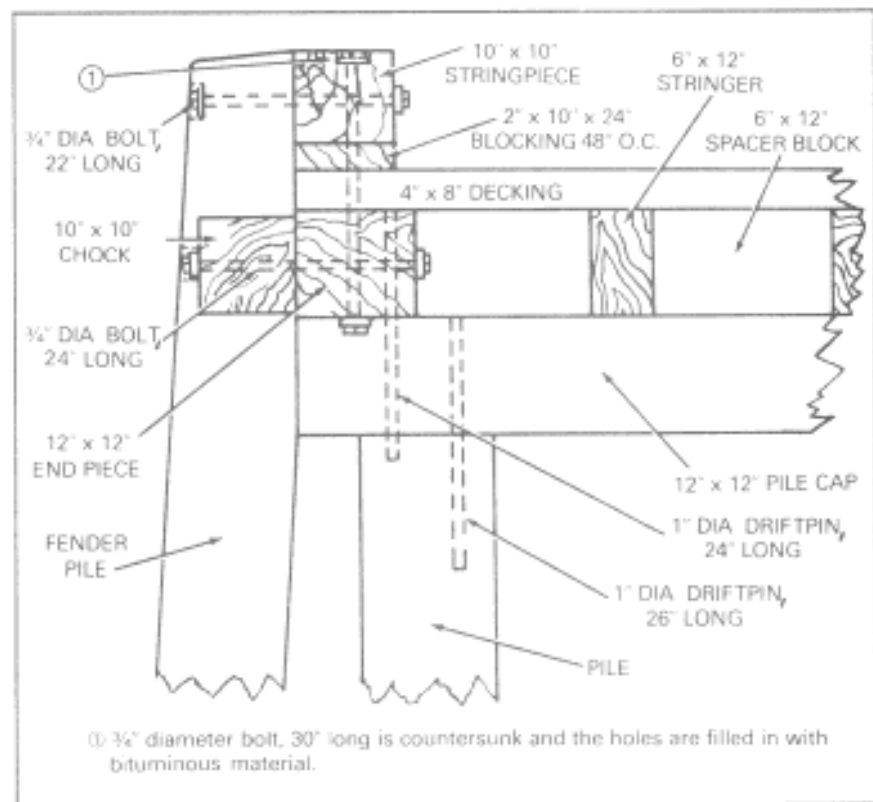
Wharf-edge cross-section of a timber-pile wharf
